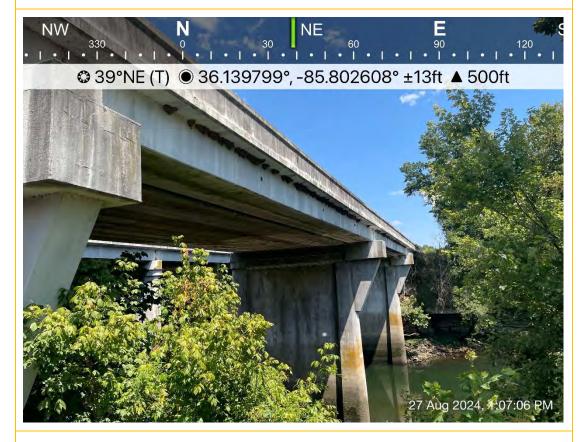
Swallows' nests on EB I-40 bridge over STR-1 (Caney Fork River) at LM 17.16
